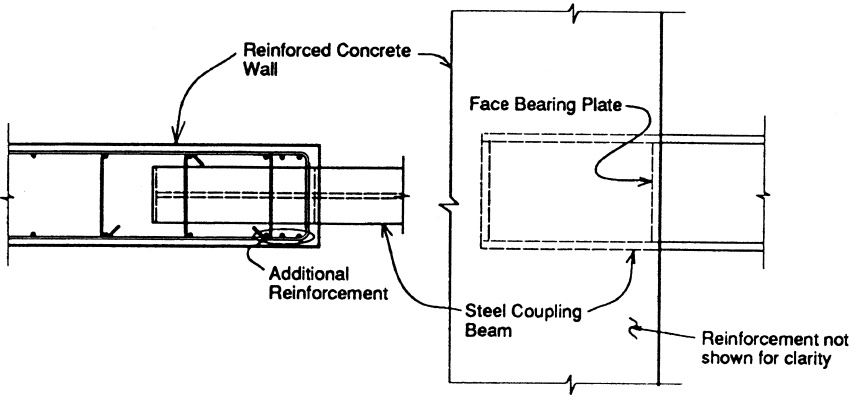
Steel coupling beam to reinforced concrete wall.
